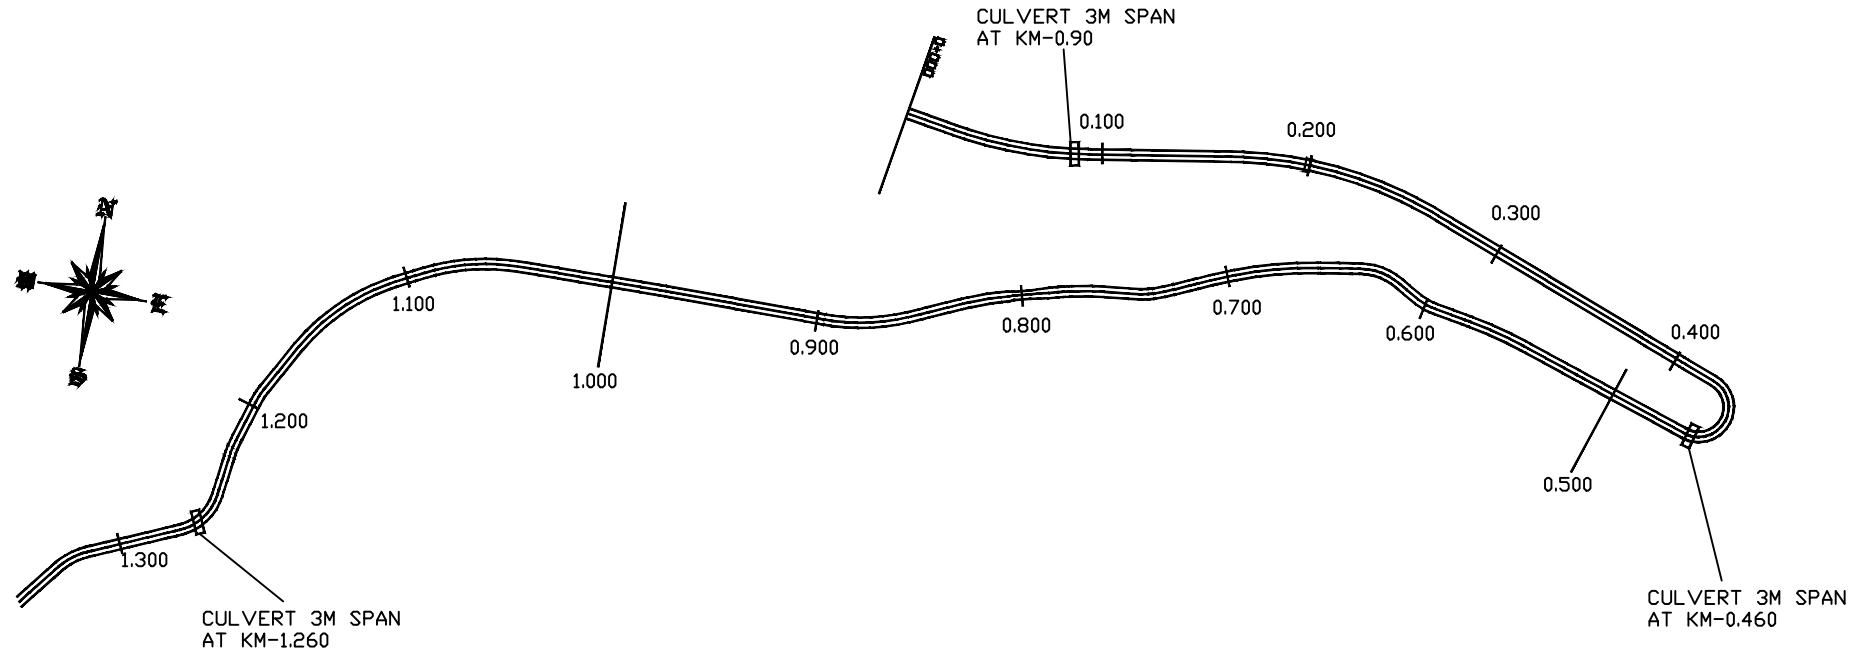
DETAILS OF ANIMAL CROSSING LOCATION ON ROAD MANGAN-CHUNGTHANG
